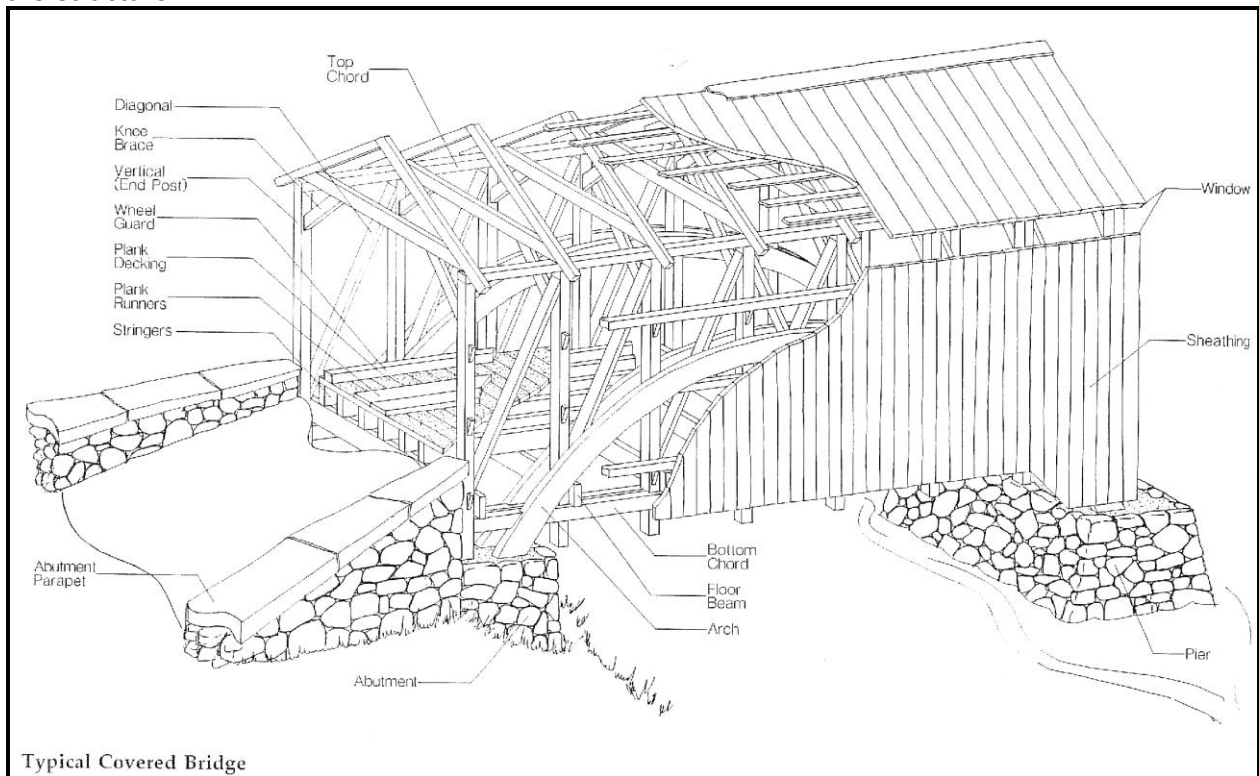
Typical Example of the Construction Methods of a Timber Covered Bridge
